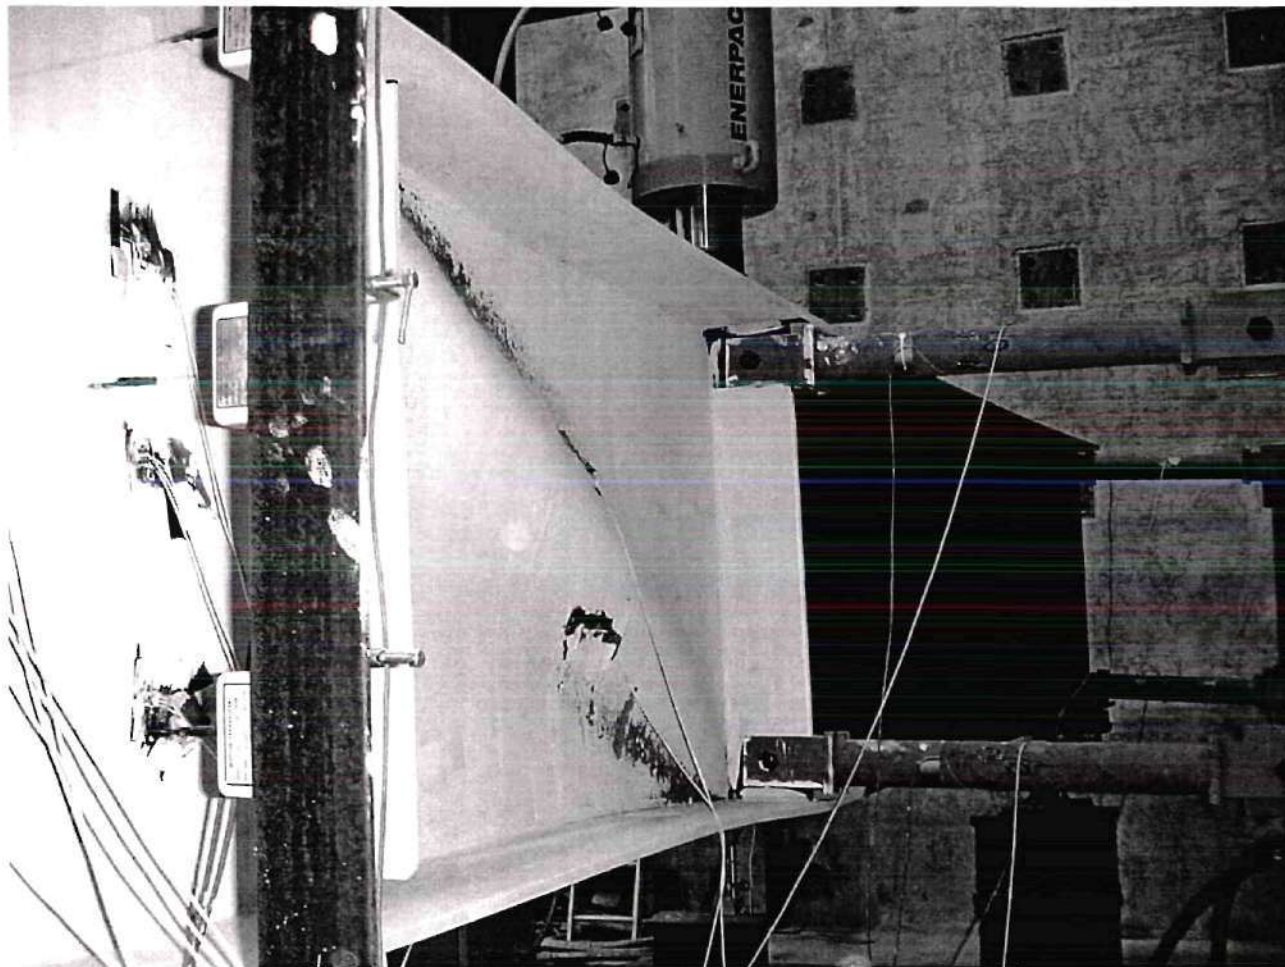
Specimen S1S-0.10 at the end of the test (view from concave side of location 3).
